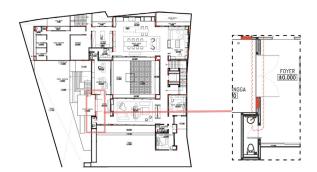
Solution for the wall shifting, Wungkal House Source: Document of SS (2021)
